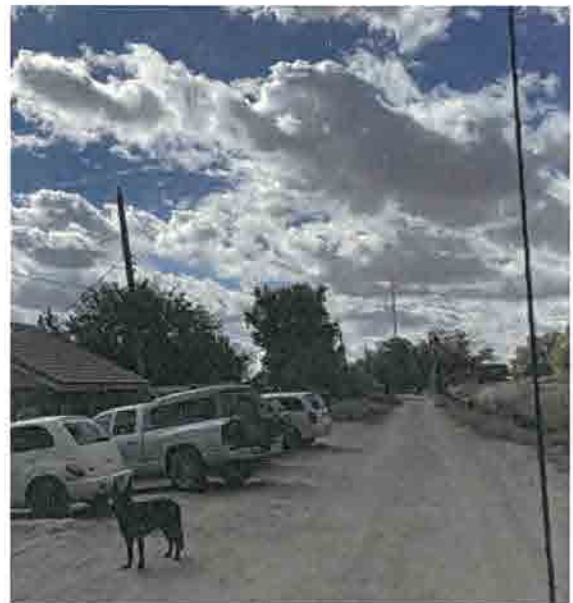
DRAIN BEING USED FOR PARKING IS AN ISSUE
